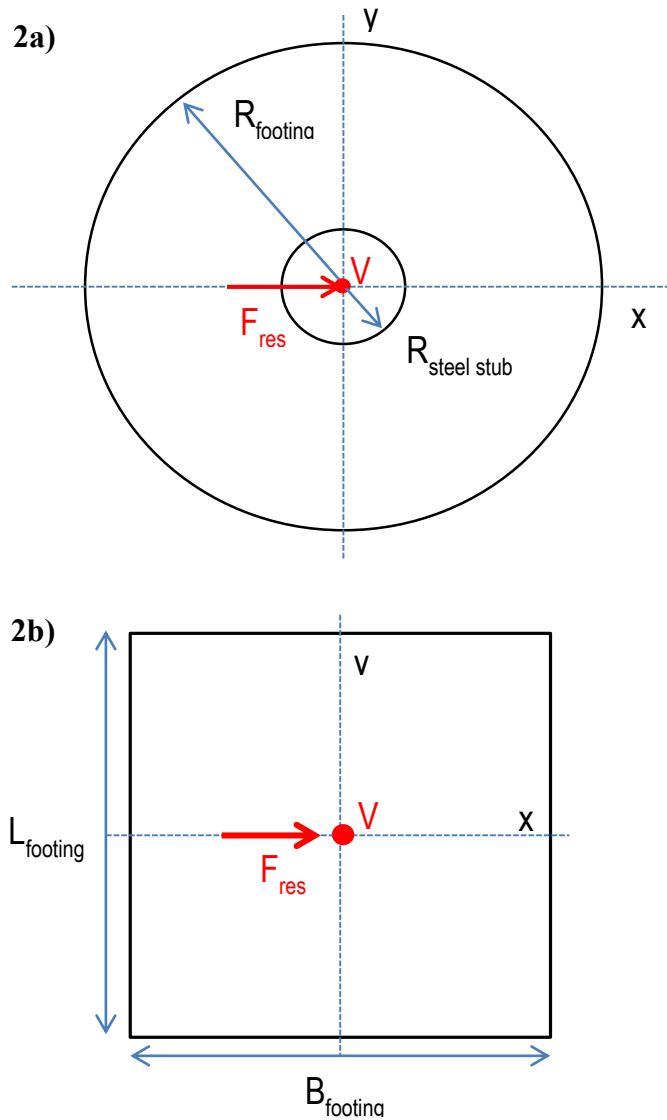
Plan and Profile views of (1,2a) circular and (1,2b) square foundations
